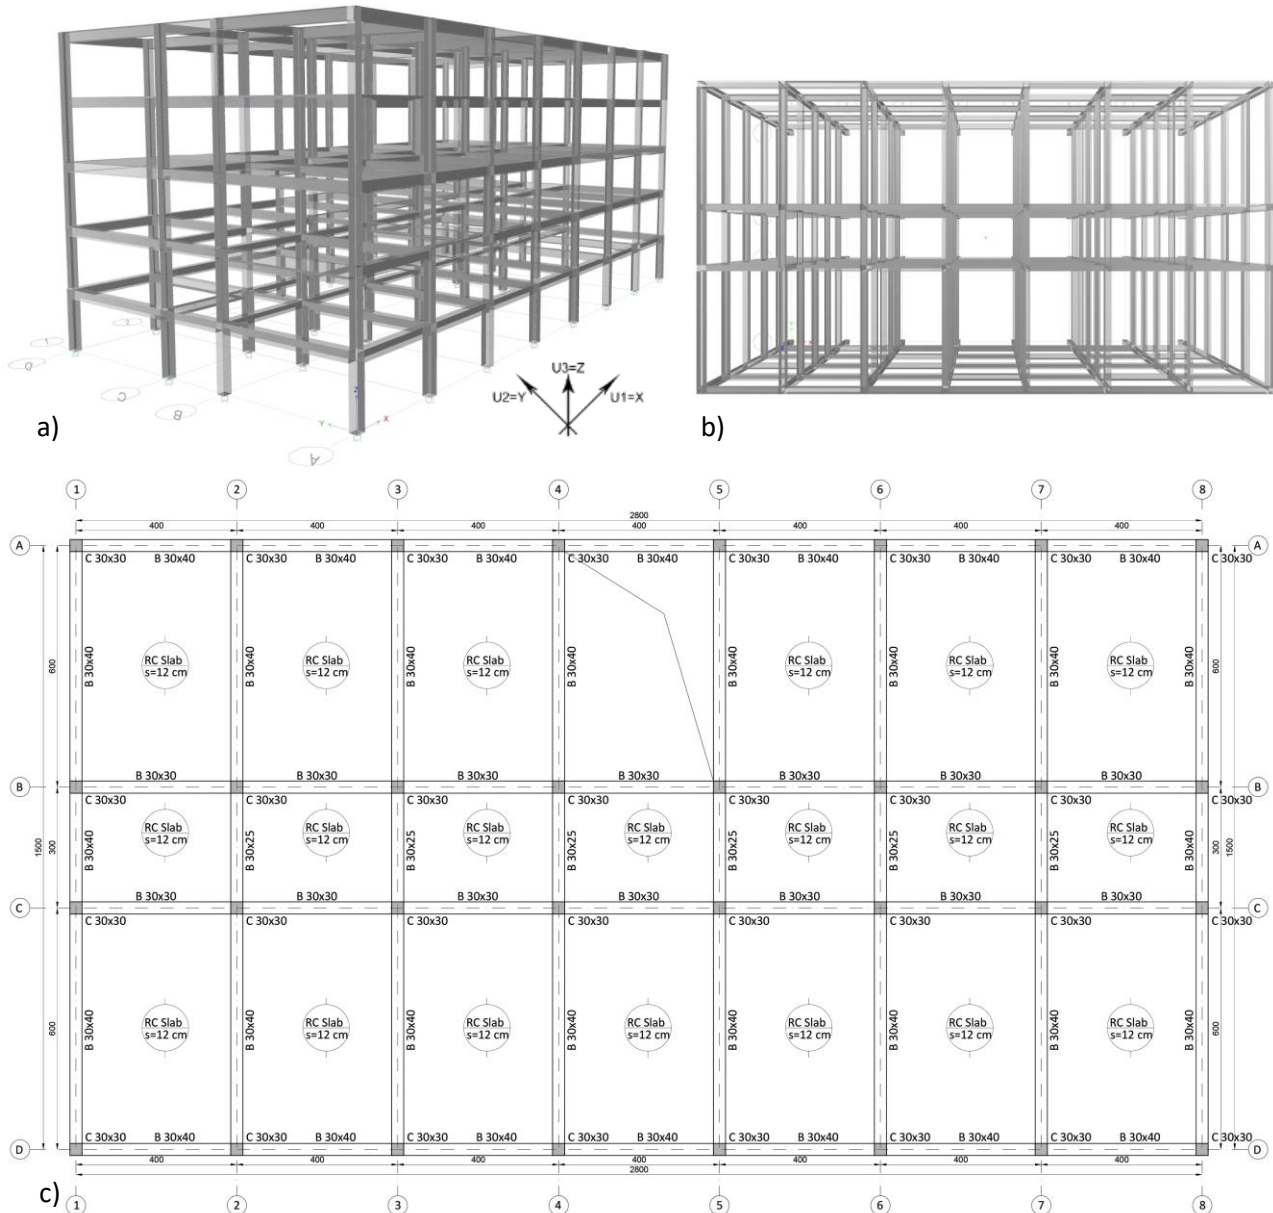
a) and b) Panoramic views of the finite element model of the initial state of the RC MRF; c) typical horizontal cross section of the MRF. Due to the symmetry of the structure only half of the planimetry is shown. Cross-sectional dimensions of beams (B) and columns (C) are indicated in cm together with spans
